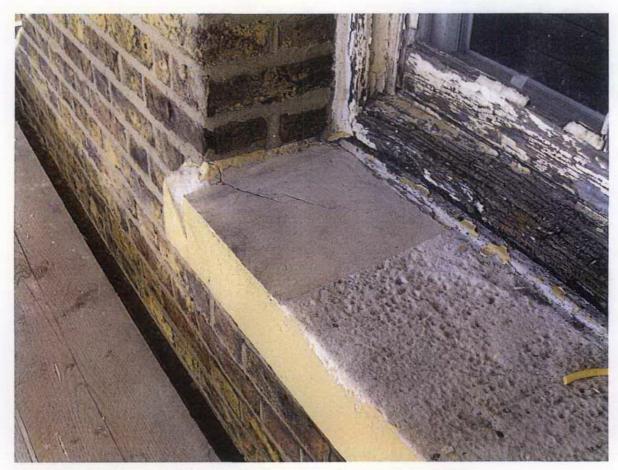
Sill of window 313/W1e showing from where stone sample was taken.
